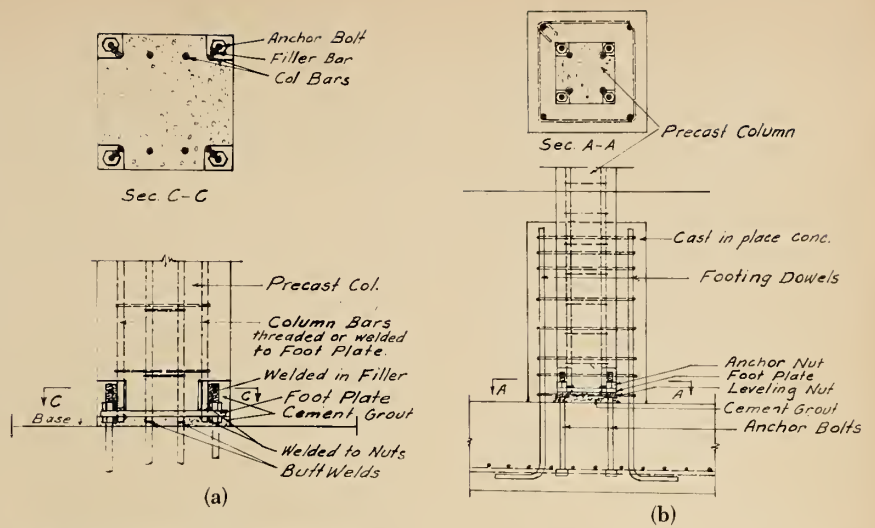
(a) Screwed and welded joint. (b) Screwed and welded joint with collar reinforcement.
